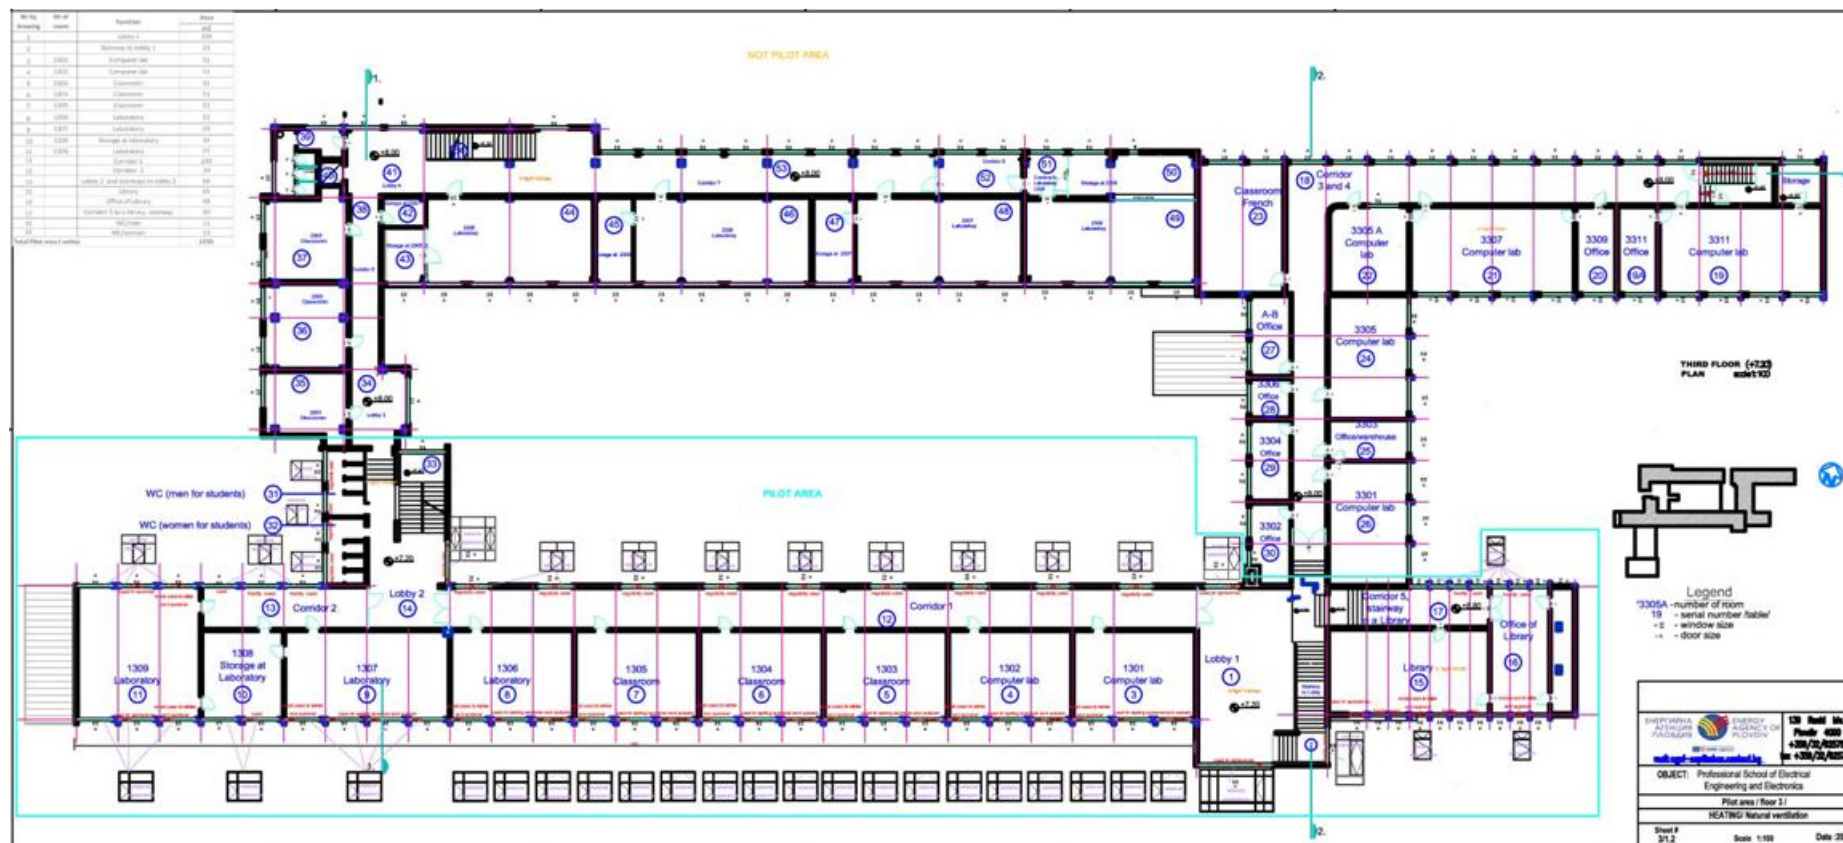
Plovdiv School: 3rd floor windows plant (Pilot area in blue lines)
